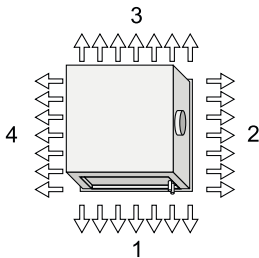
Top view, nozzle setting, single-module unit, PARASOL, sides 1-4.
